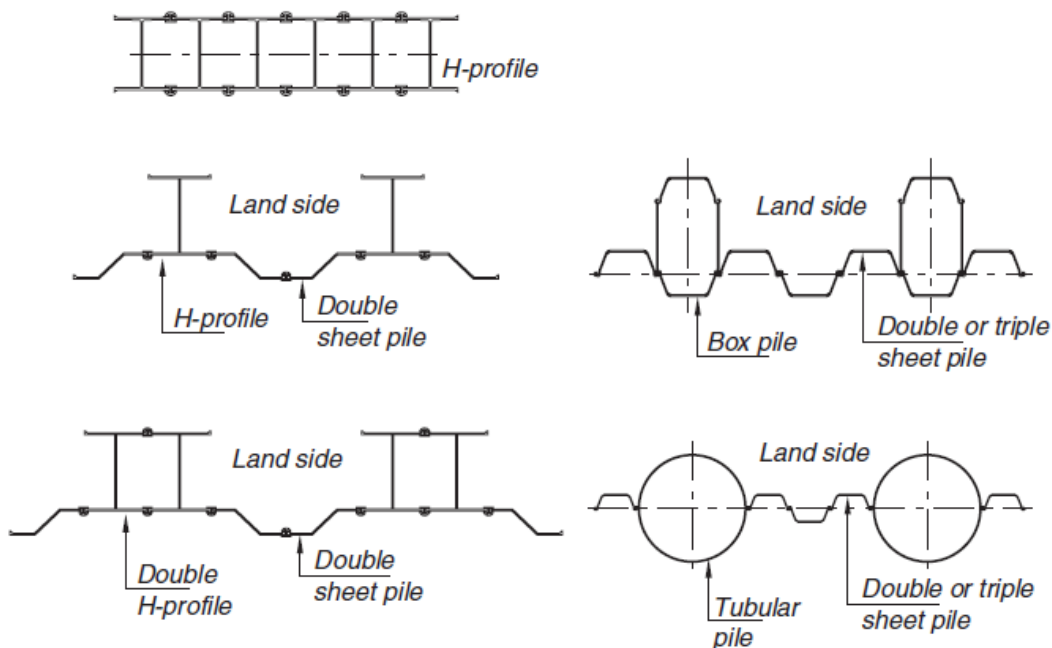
Horizontal cross-sections for the combined wall. Various profiles are shown (de Gijt & Broeken, 2013).
